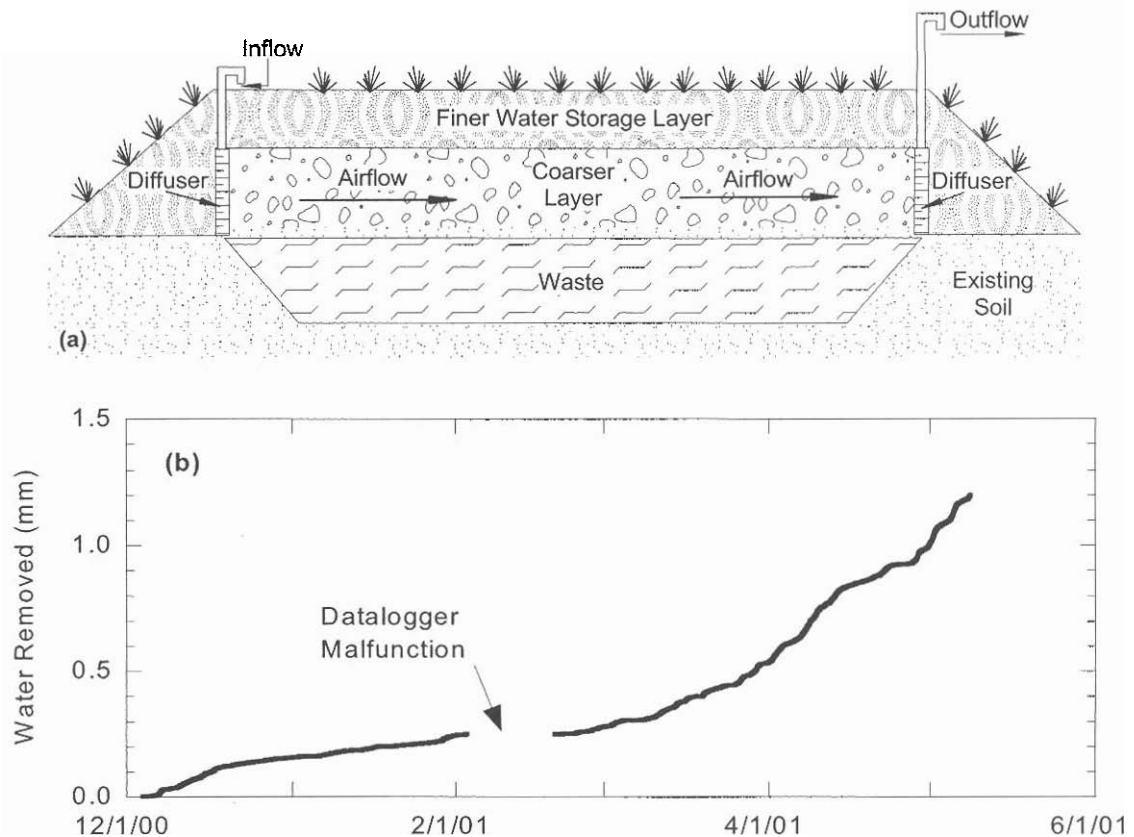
Schematic of dry barrier test section (a) and water removed from test section during monitoring period (b) (adapted from Albrecht 2001 and Albrecht and Benson 2002).
